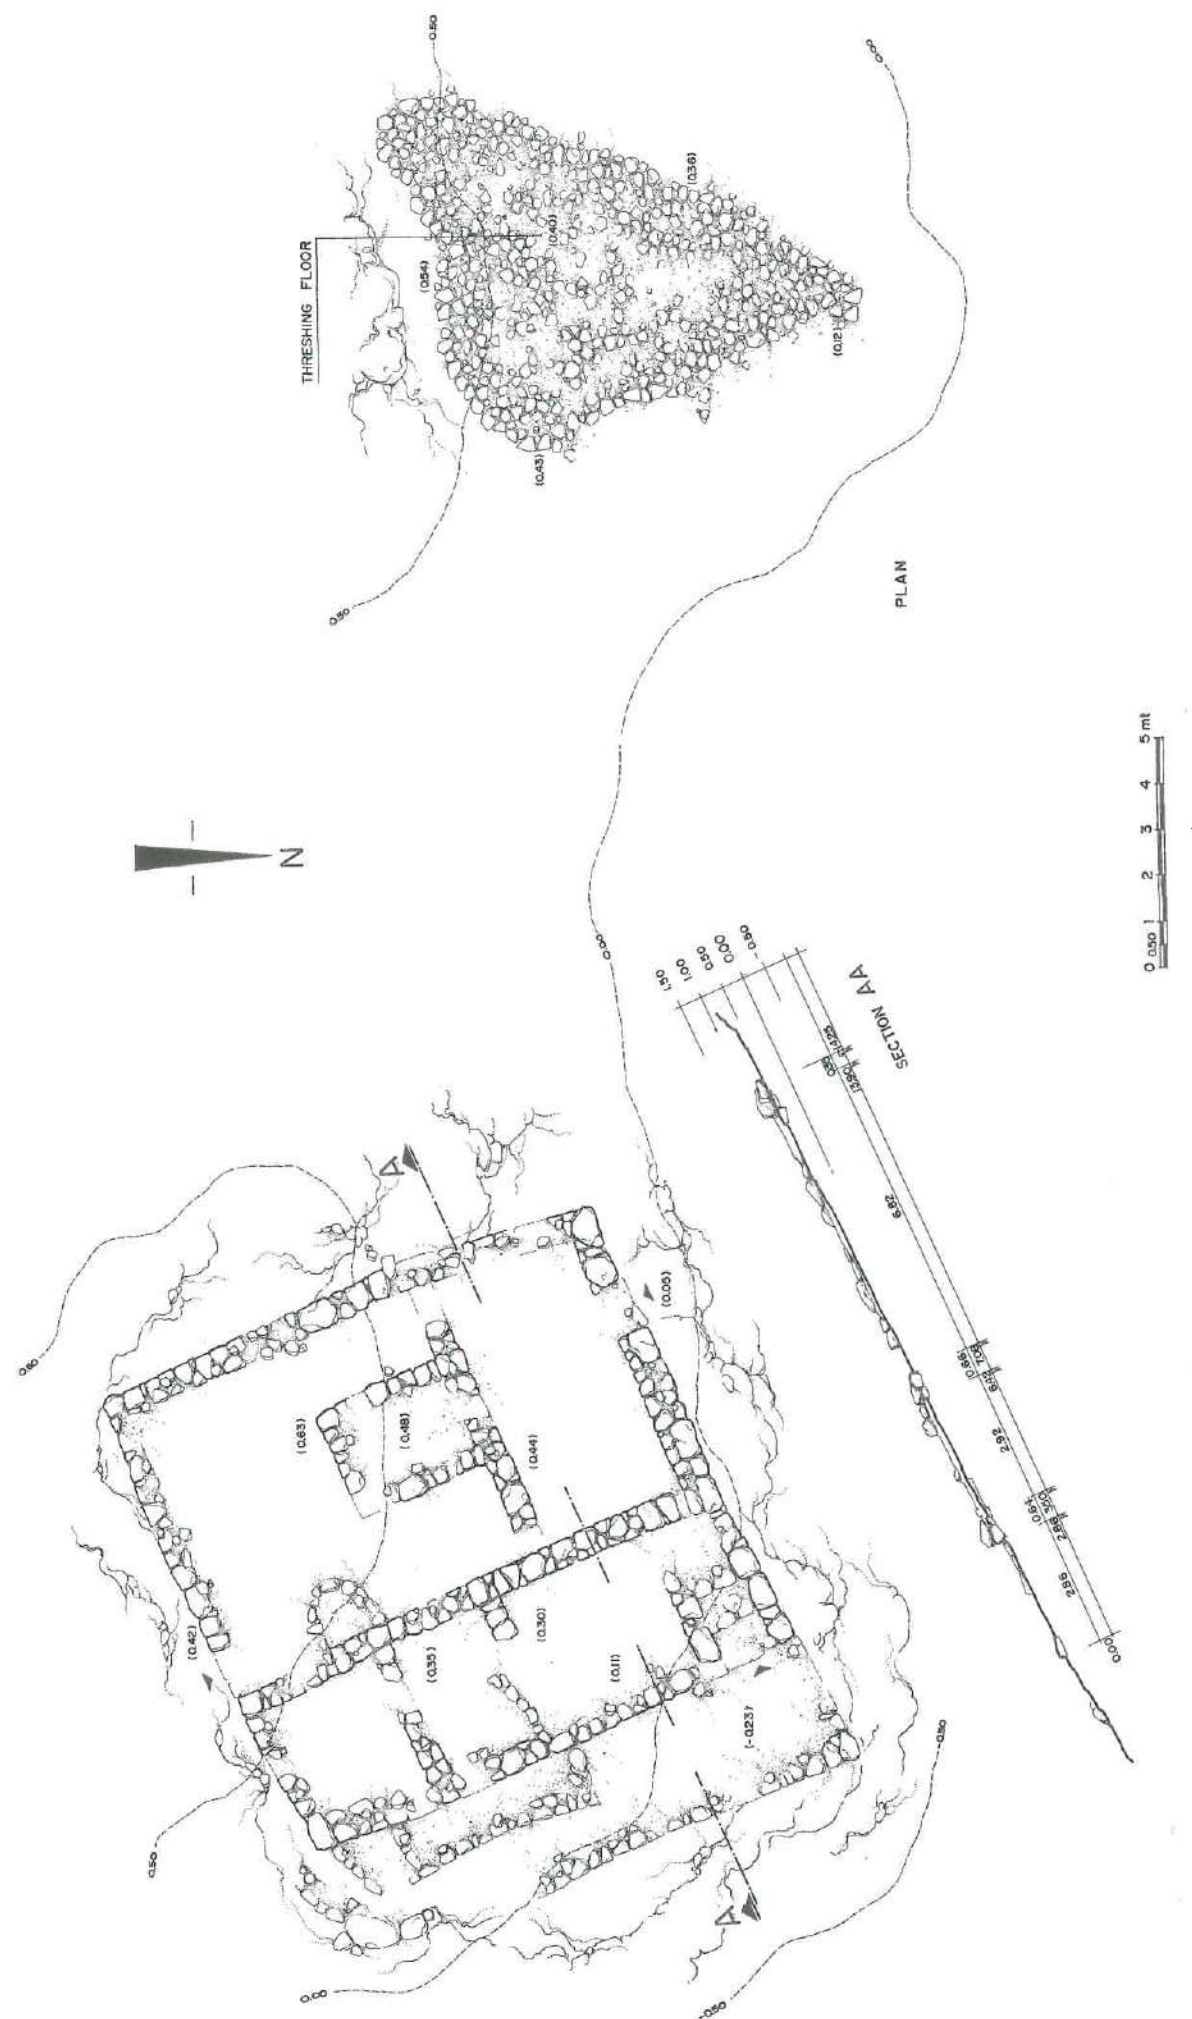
Al-Hajfah (Dhamār). Plan and sections of building HGii.
